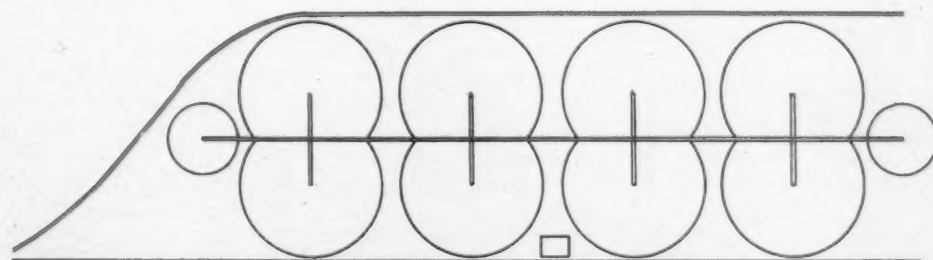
Aggregate plant's stock pile and loading facilities arranged for rapid and economical development of storage
